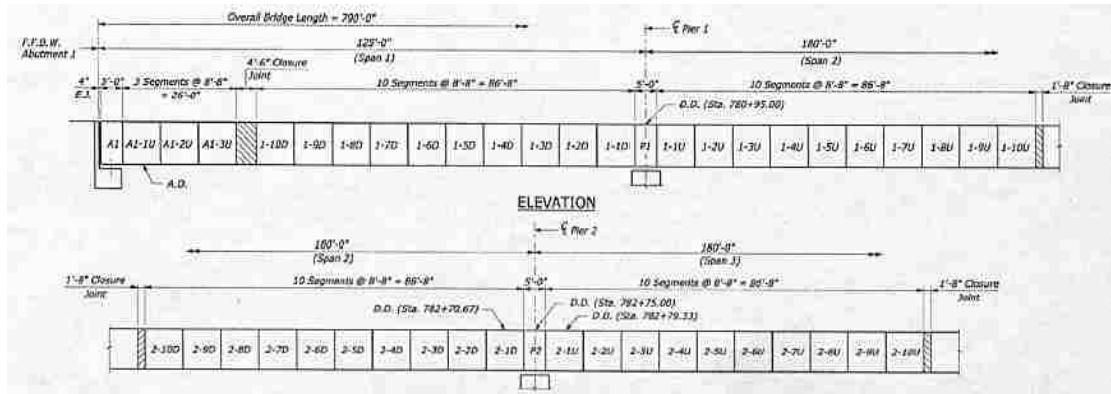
Cantilever Segments Construction (Corvern Engineering, 2010).
